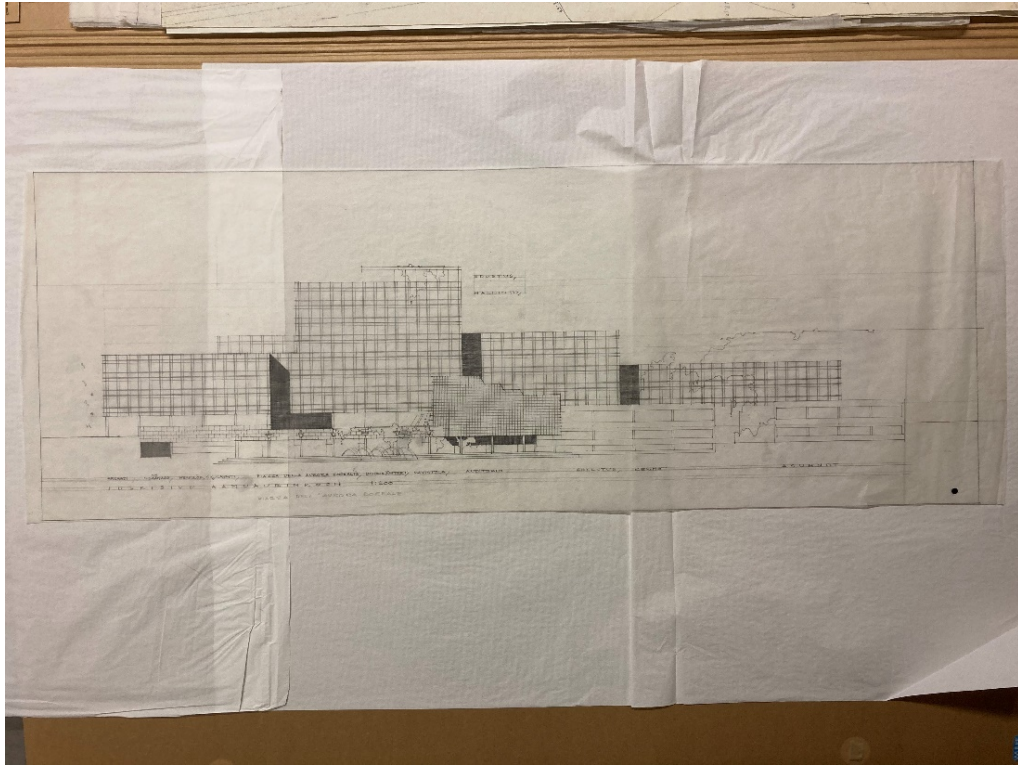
Maiandros (Stage 1), East Elevation (Study with Vertical Grid Façade)
